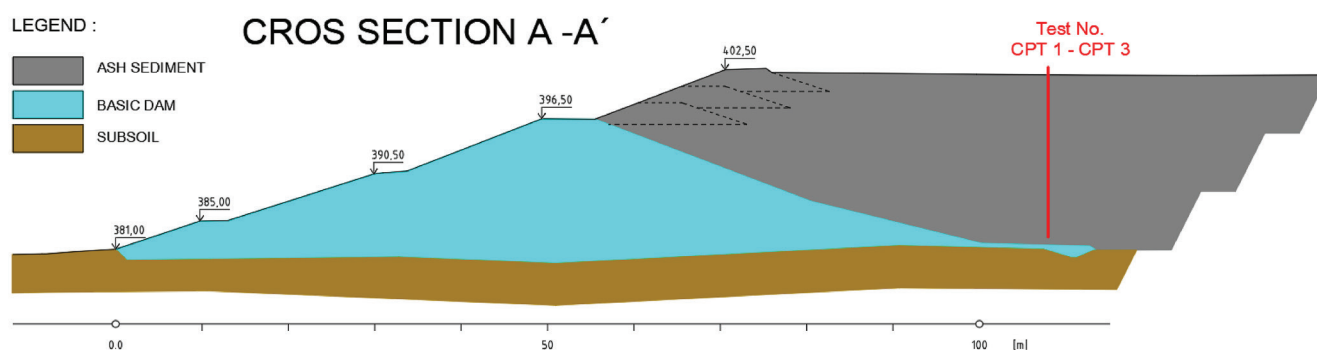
Section of the Rosina tailing pond in Žilina with the locations of the CPT tests
